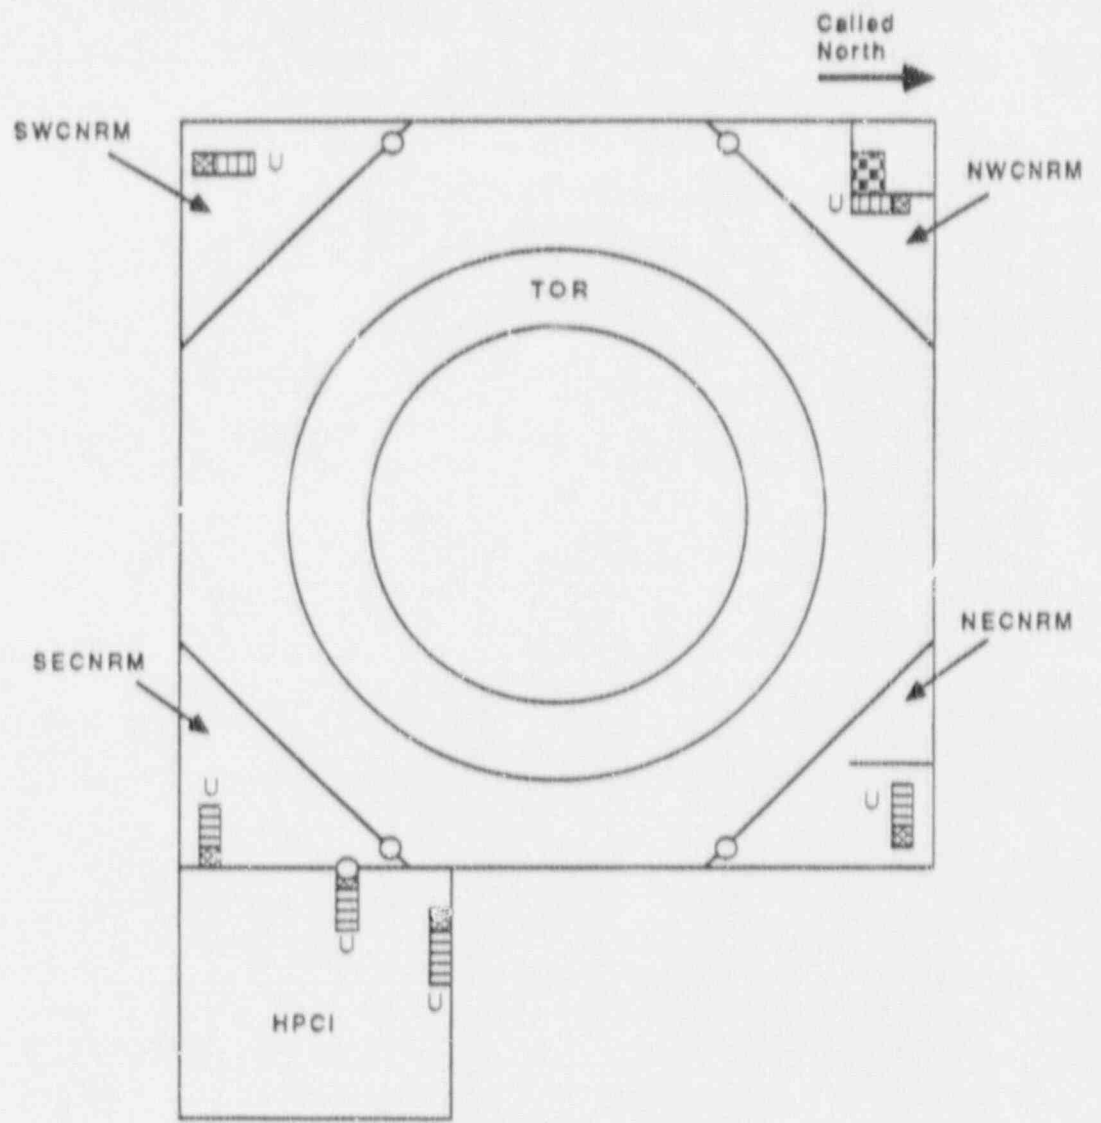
Enrico Fermi Unit 2 - Reactor Building and Auxilliary Building - 540 ft. Elevation
